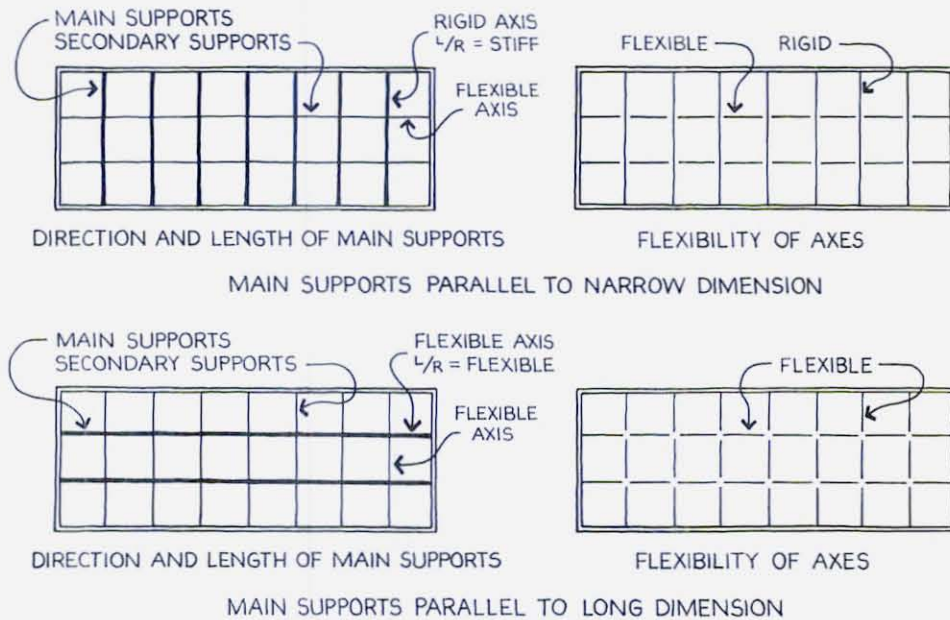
LONG, NARROW ROOM CEILING PLAN: EFFECT OF DIRECTION AND LENGTH OF SUPPORT MEMBER ON ITS FLEXIBILITY.
